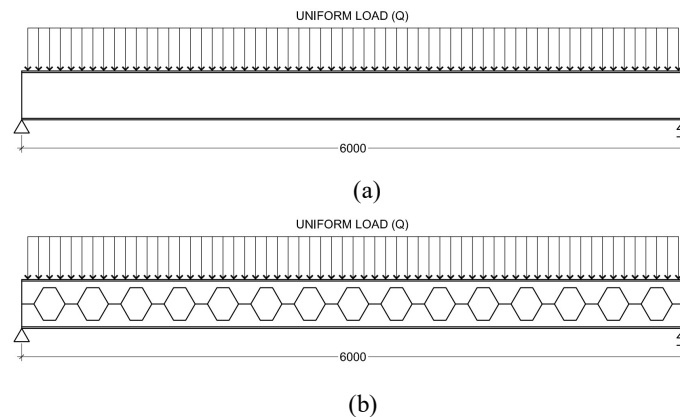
Type of Load and Support that will be Used to, (a) IWF Beam, (b) Castellated Steel Beam
